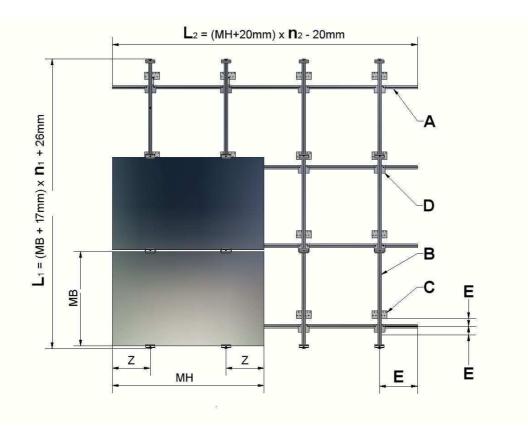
Roof hook connecting rails for laminate installation in relation to the system as a whole
